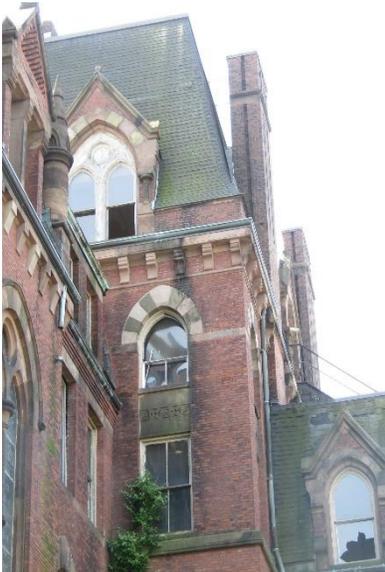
North façade: Missing and cracked window glass. Damaged window frame. Soiled masonry.
